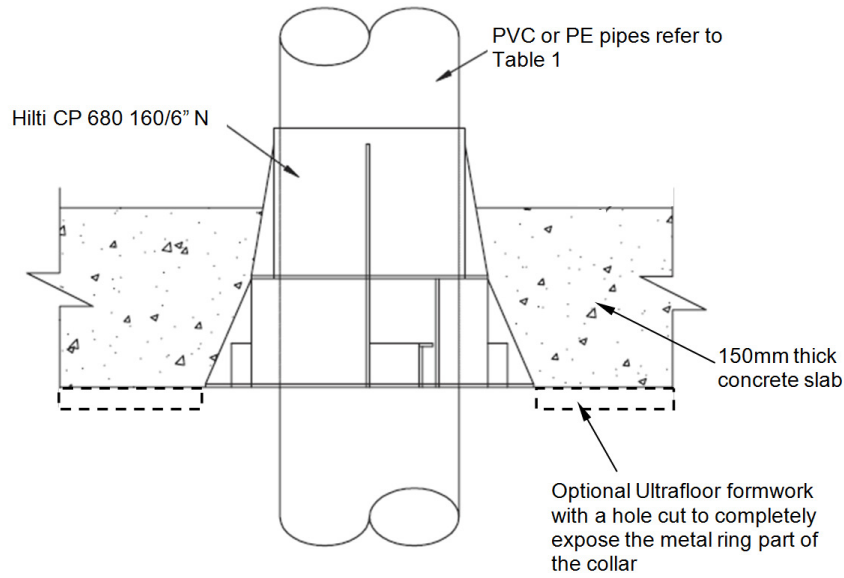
Stack pipes protected with Hilti CP 160/6” N with or without Ultrafloor
